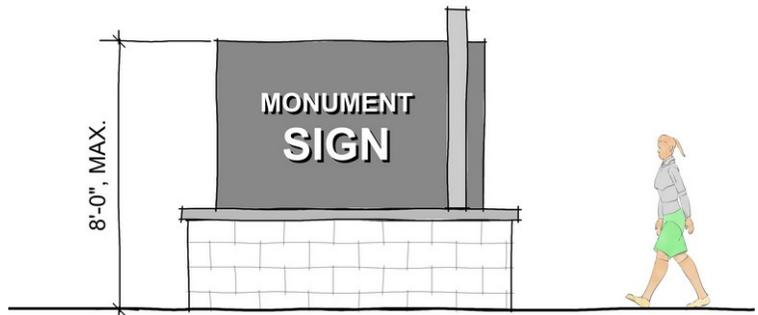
Acceptable Monument Sign with Masonry or Stone Base
